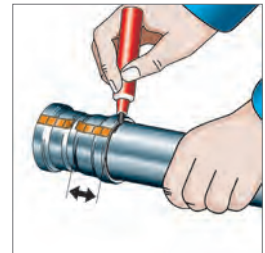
Push the press connector up to the marked insertion depth on the pipe.
